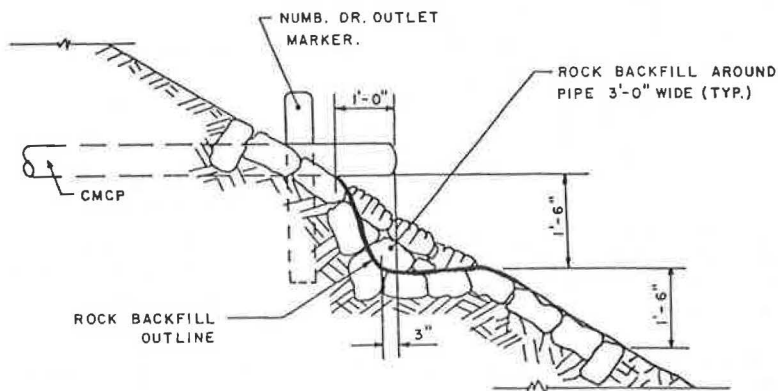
Typical detail of drainage outlet with rock backfill.
